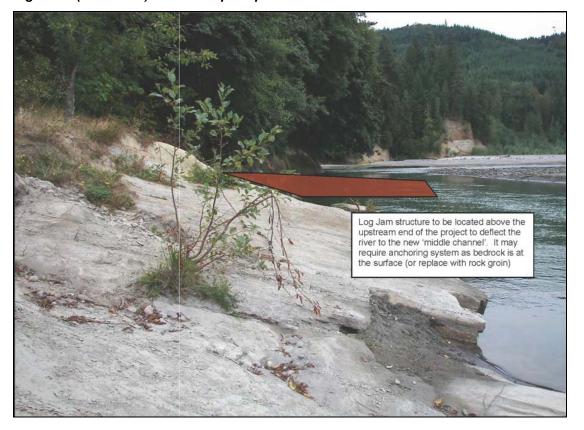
(continued). LT-1 Sump Proposed Alternative Photos
